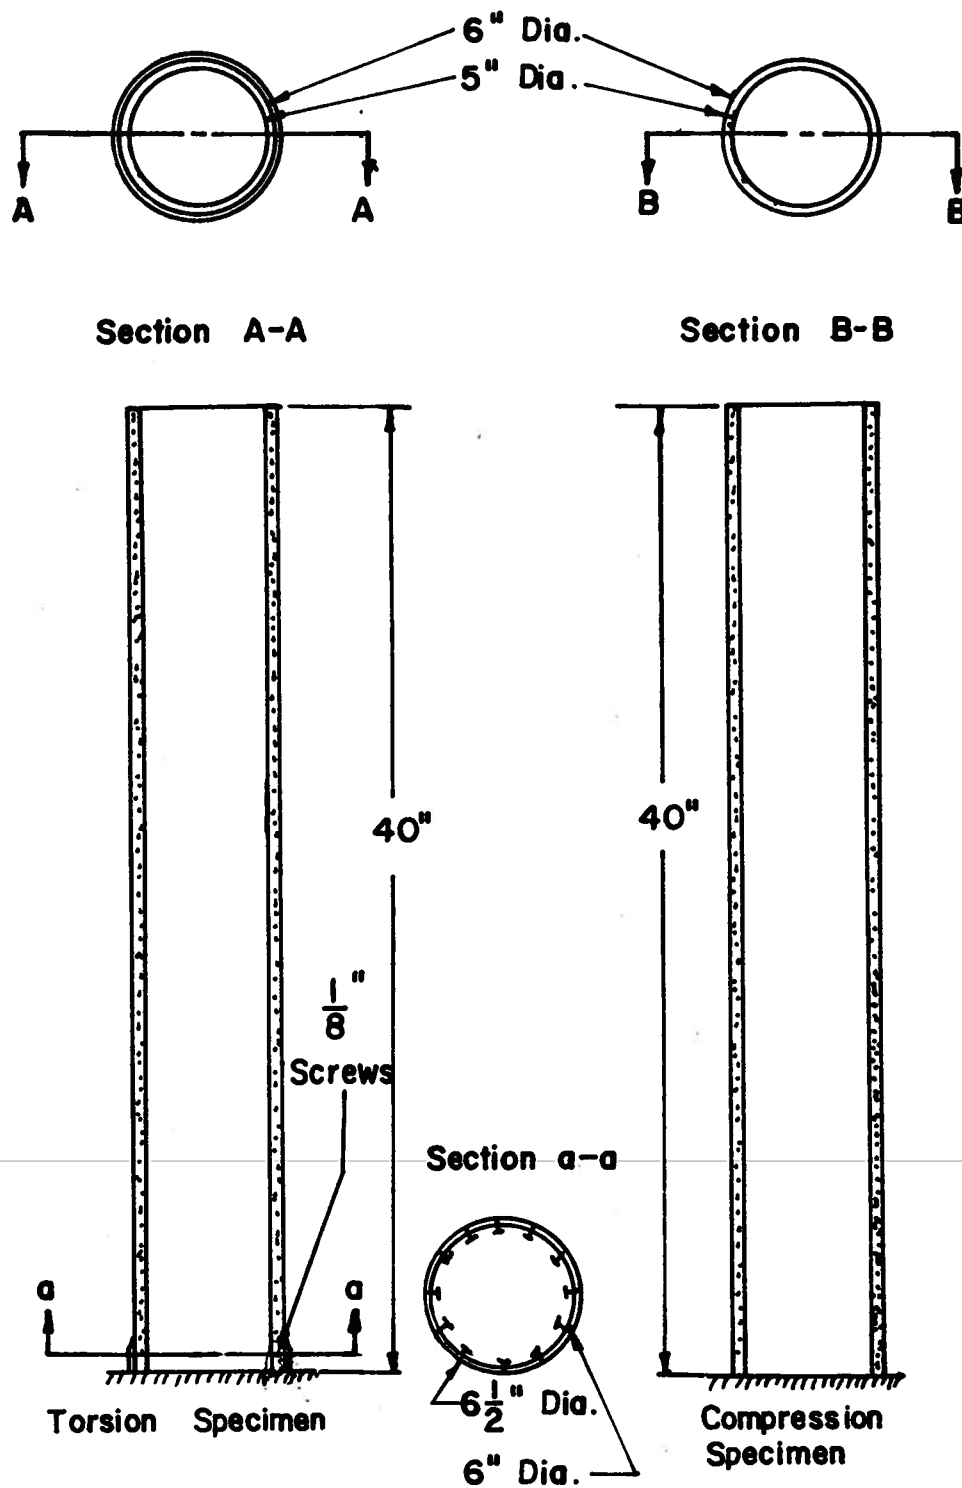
DETAILS OF SPECIMEN FABRICATION
